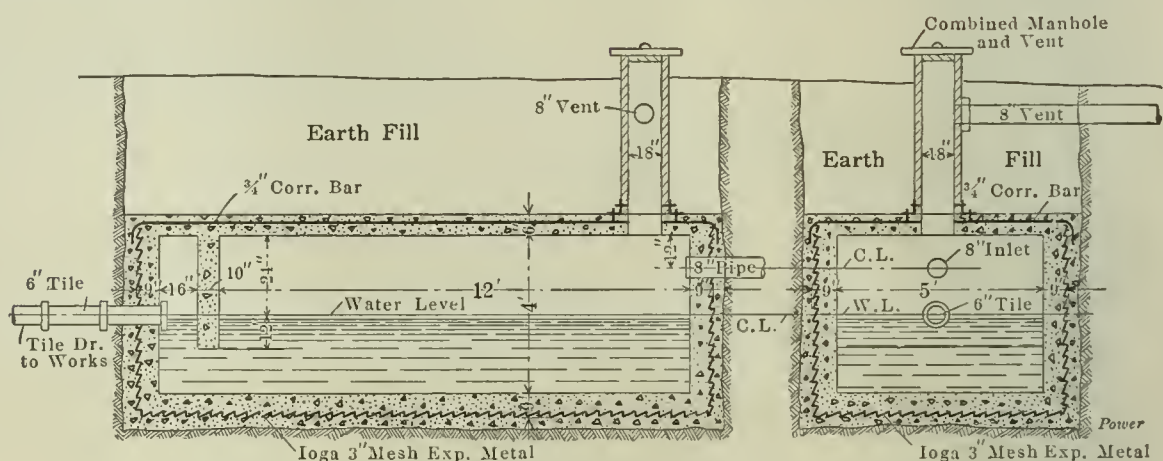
DETAILS OF REINFORCED-CONCRETE BLOWOFF SUMP
